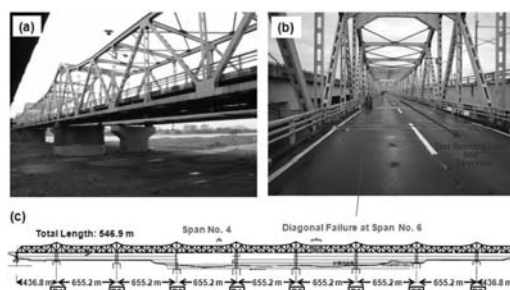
Pictures of outside (a) and inside (b) of the bridge. (c) Elevation of the bridge.
